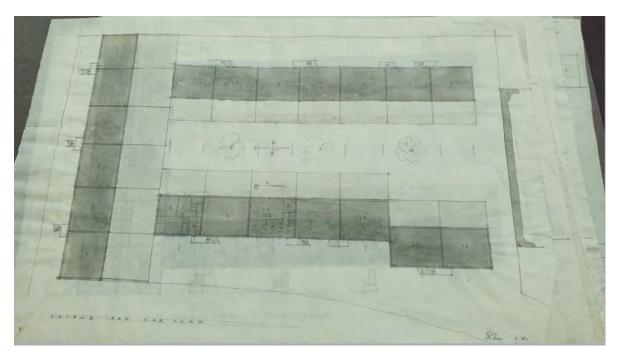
Floor plan for proposed carpark with above residences at Double Bay, Cross Street (Source: State Library of NSW, PXD 351, Roll No. 120, ff1216)
